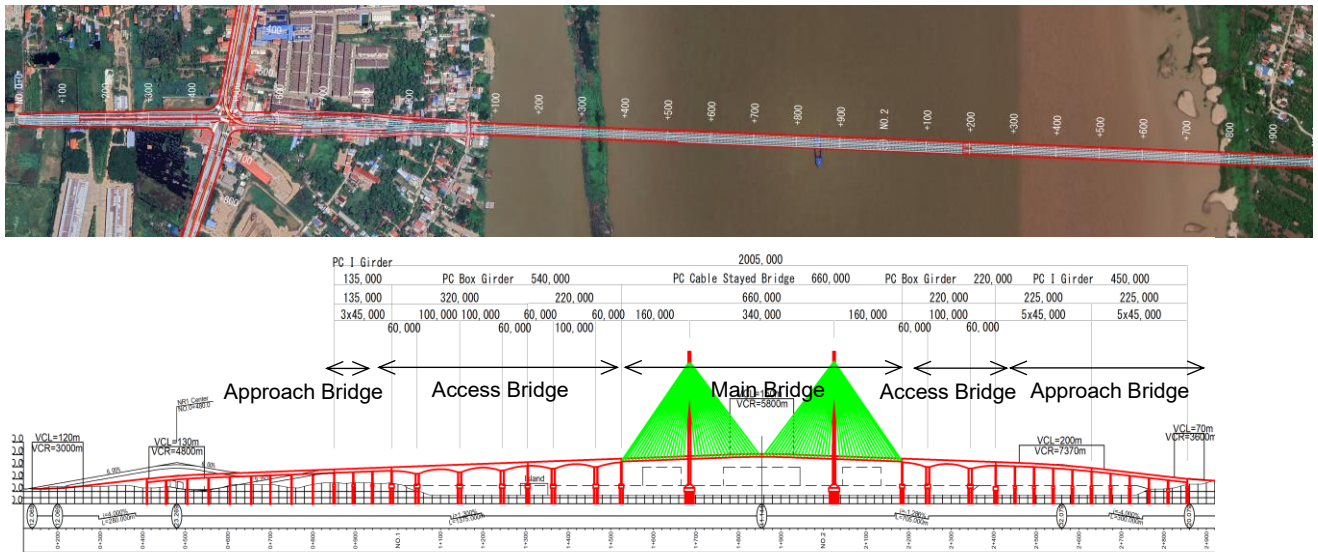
Plan and Profile of the Mekong River Bridge
